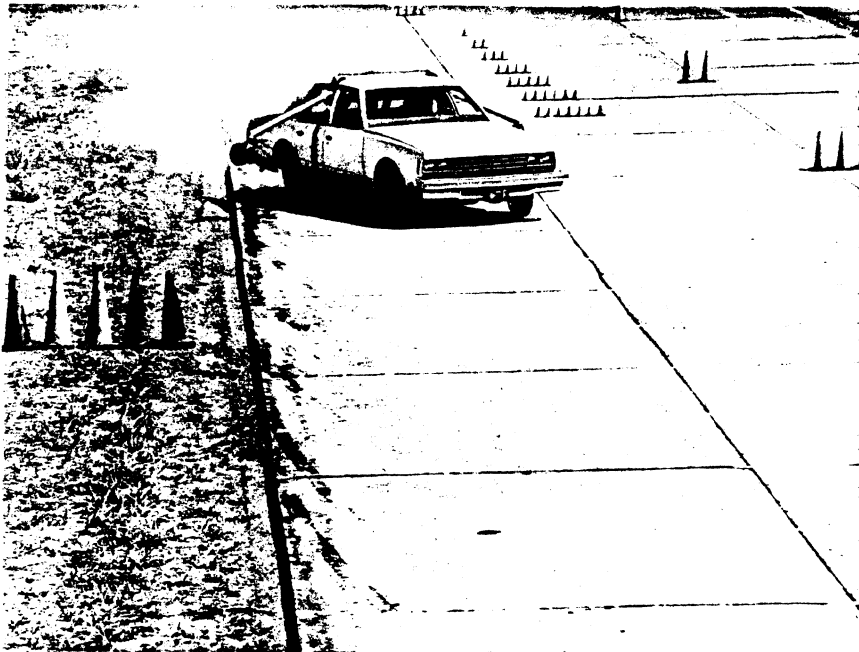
Photograph of test vehicle immediately after the rear wheel has mounted the edge drop.
